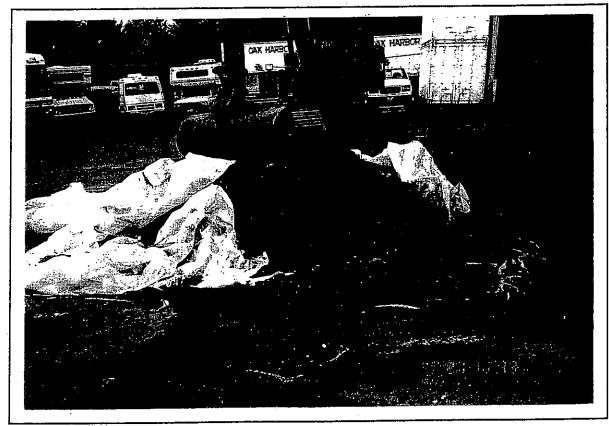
Contaminated Soil from Below the O/W Separator. Note 1,000-g Waste Oil Tank in Background.
